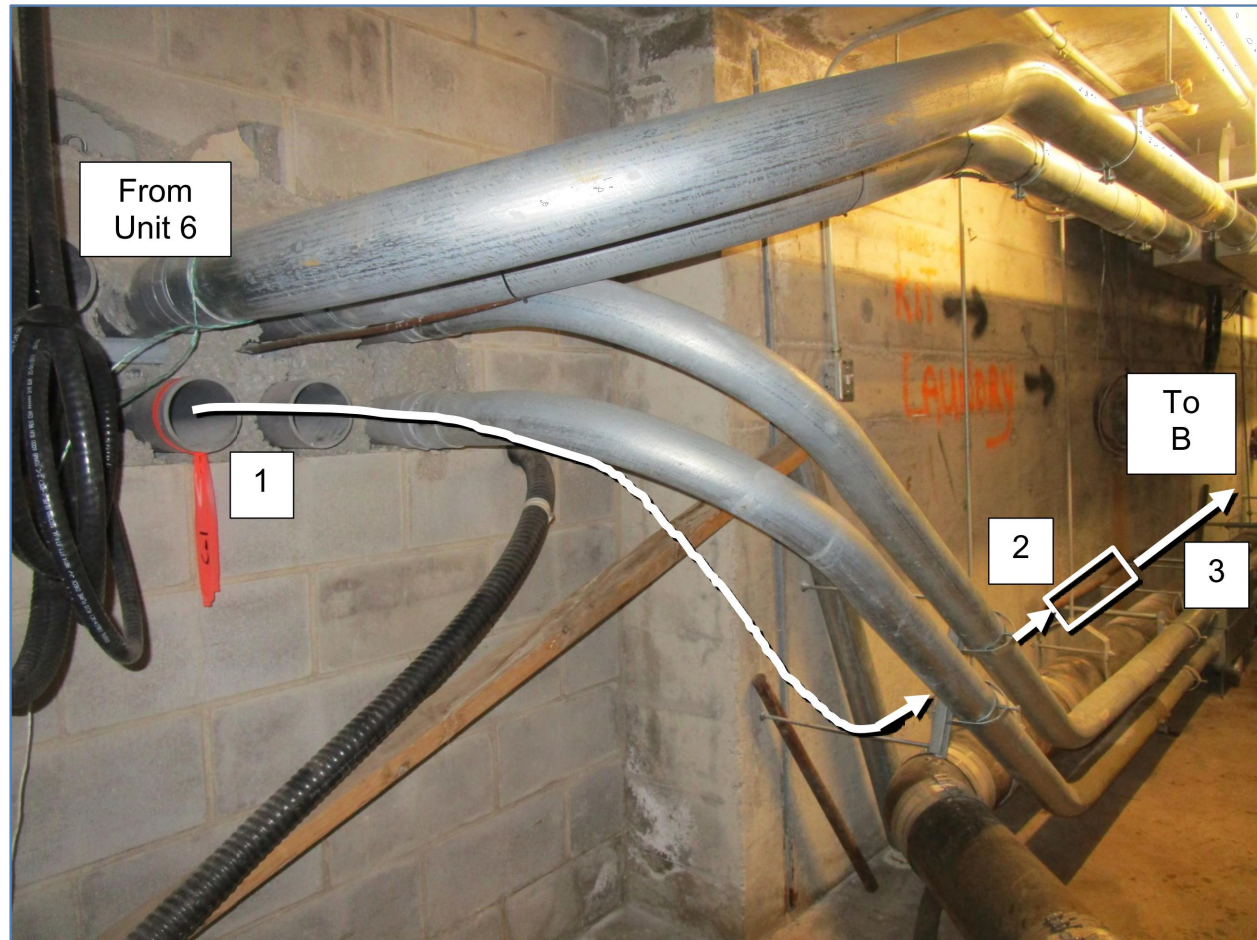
Location A, transition from Unit 6 conduit to tunnel wall
